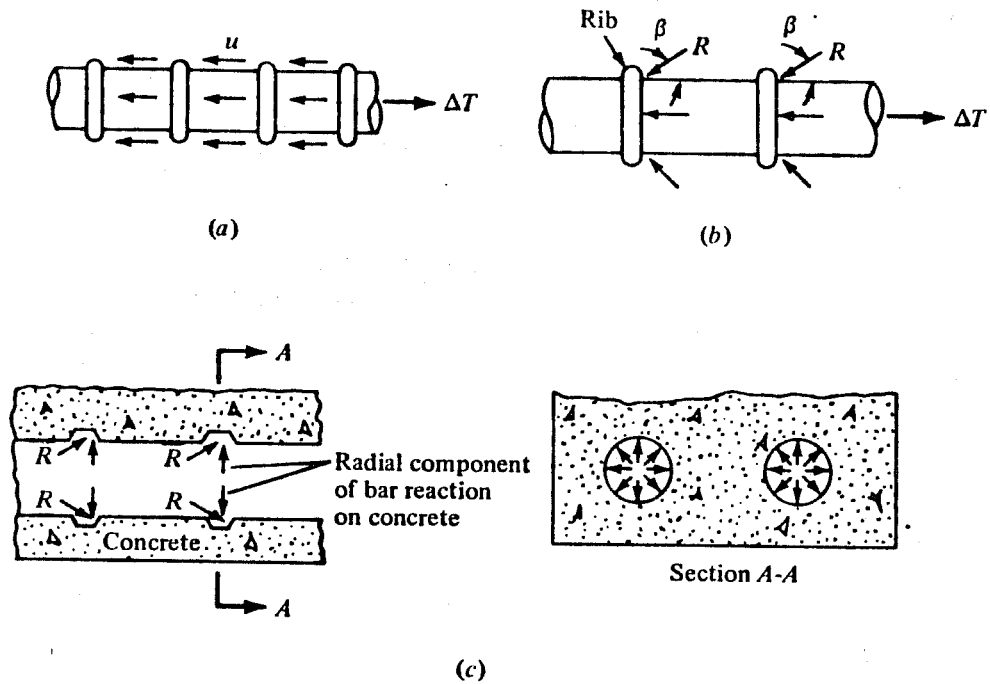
Sources of bond strength: (a) bond stresses due to friction and chemical adhesion between concrete and steel; (b) free-body diagram of reinforcing bar showing reaction of concrete on ribs; (c) free-body diagram of concrete showing forces exerted by ribs on concrete: radial component of bar reactions acts to produce cracking and spalling of concrete surrounding the bar.
